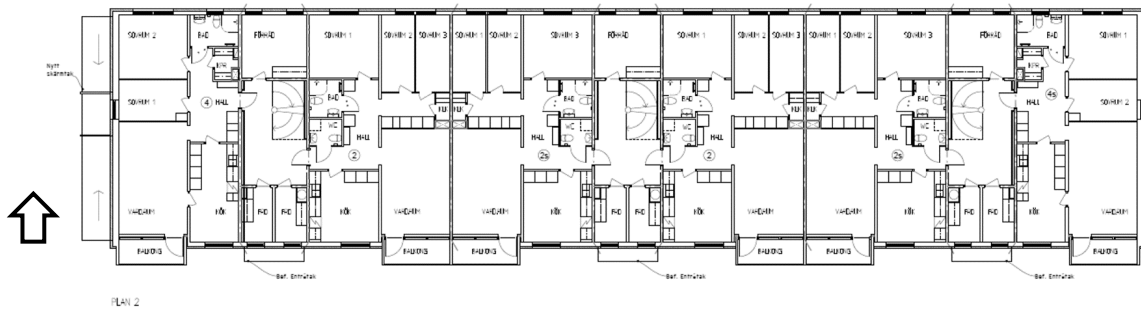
Representative floor plan of case study building. The north facing façade is upwards, as indicated by the arrow.
